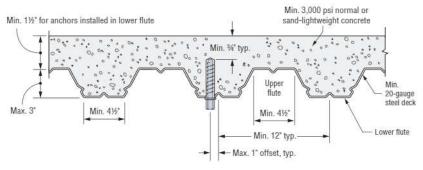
THD50234RH Installation in Concrete over Metal Deck
